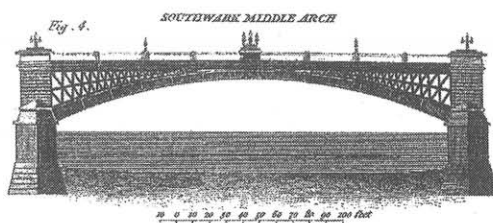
Southwark Bridge. Elevations and Young's estimation of the loads (Young, *Bridge*, 1824)
